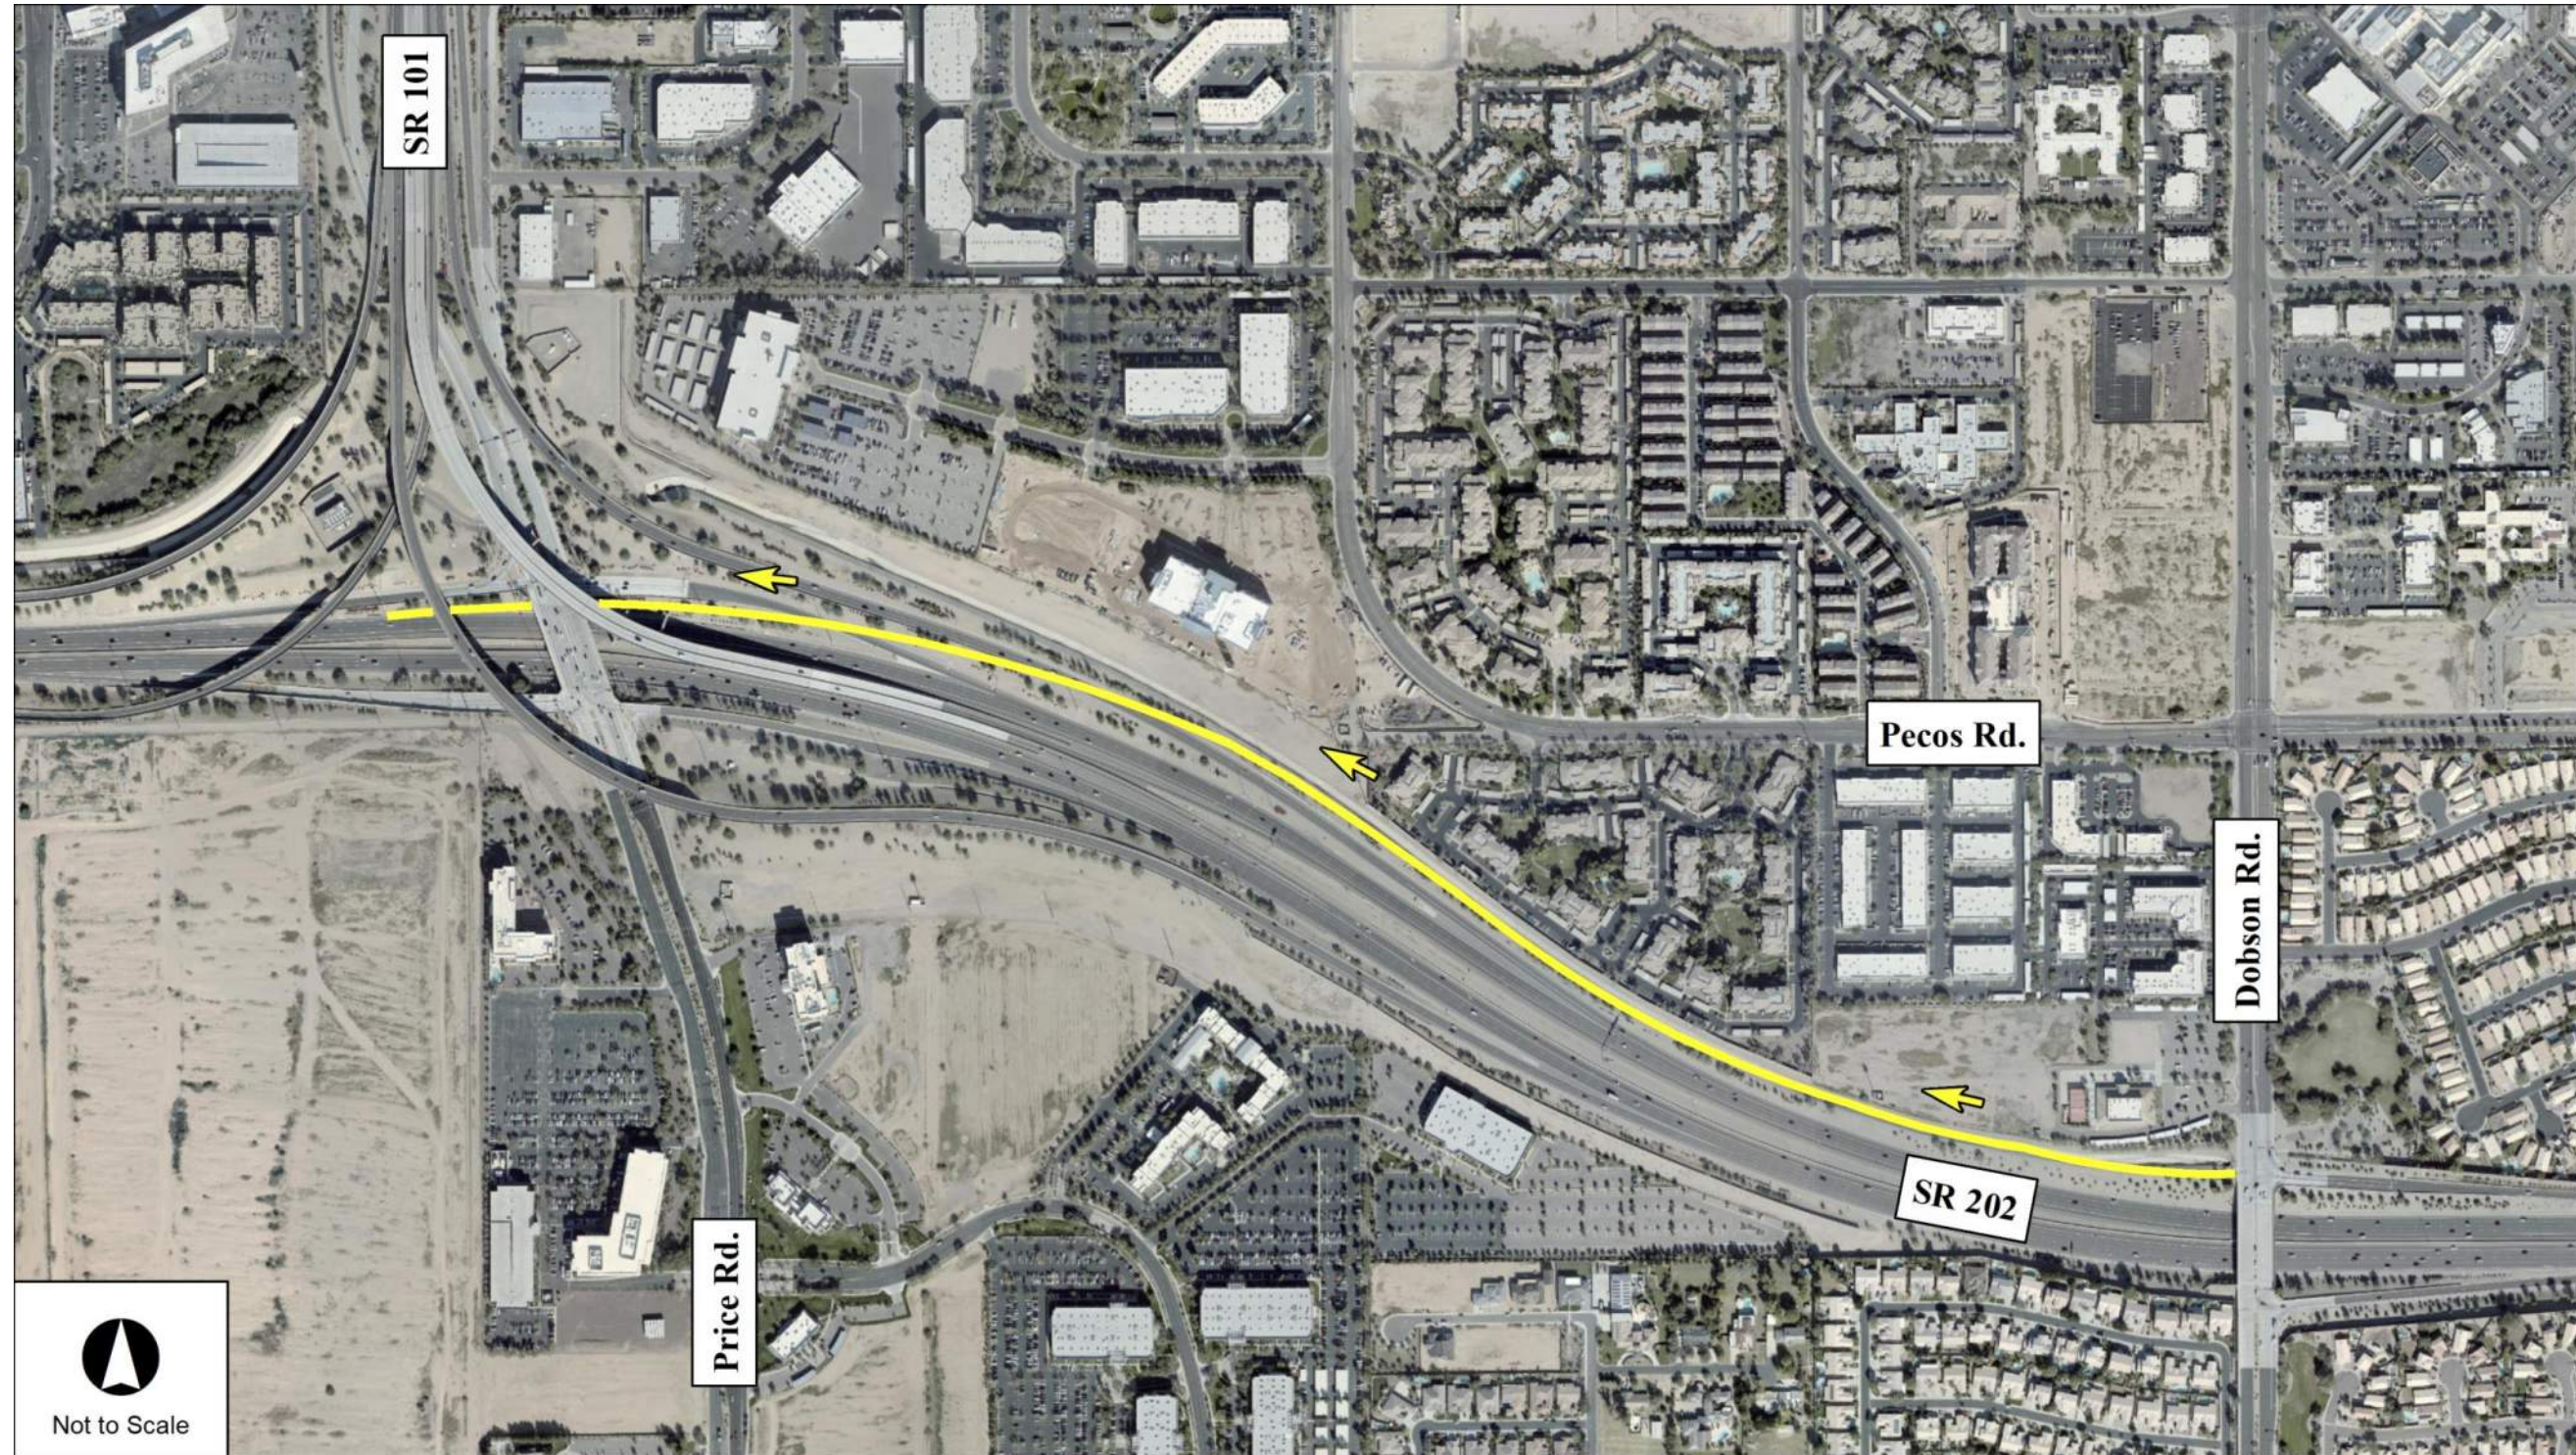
Potential Freeway Enhancement – Dobson Road Westbound Loop 202 On-Ramp
